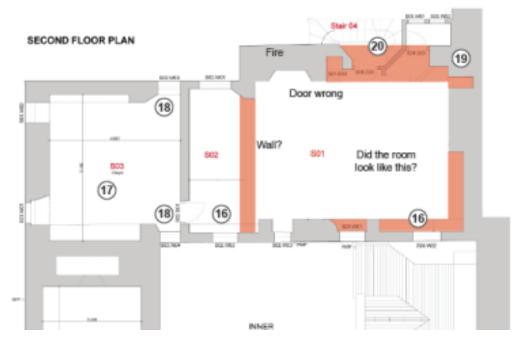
North Block - Second Floor - Room Arrangement Suggestion
